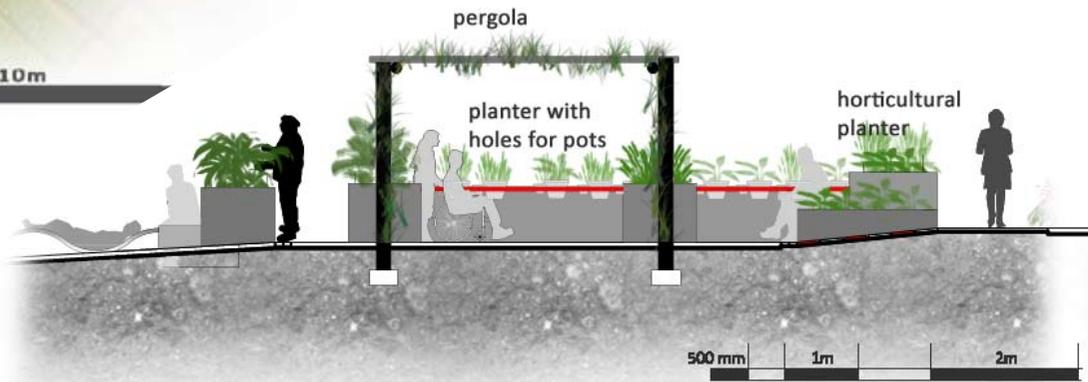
Horticultural therapy garden section (Author, 2009).
